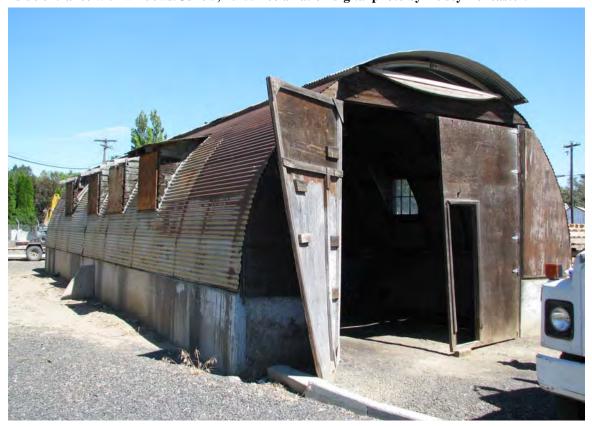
Building No. 1423 looking north at oblique view of southeast and rear elevations. Note the plywood double doors on the southeast end and plywood wall. June 5, 2015. Reclamation digital photo by Kelsey Doncaster.
